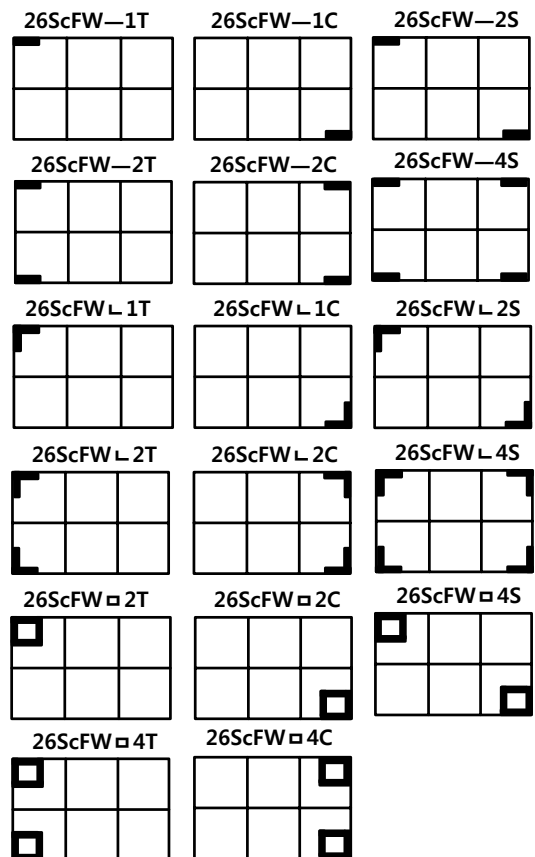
Shape, location, and nomenclature of shear walls in two-story and 6 m span buildings
